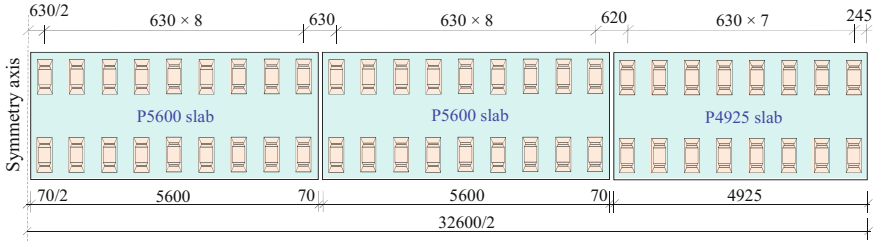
Layout plan of CRTSIII track slab units on 32 m simply-supported beam (unit: mm)
